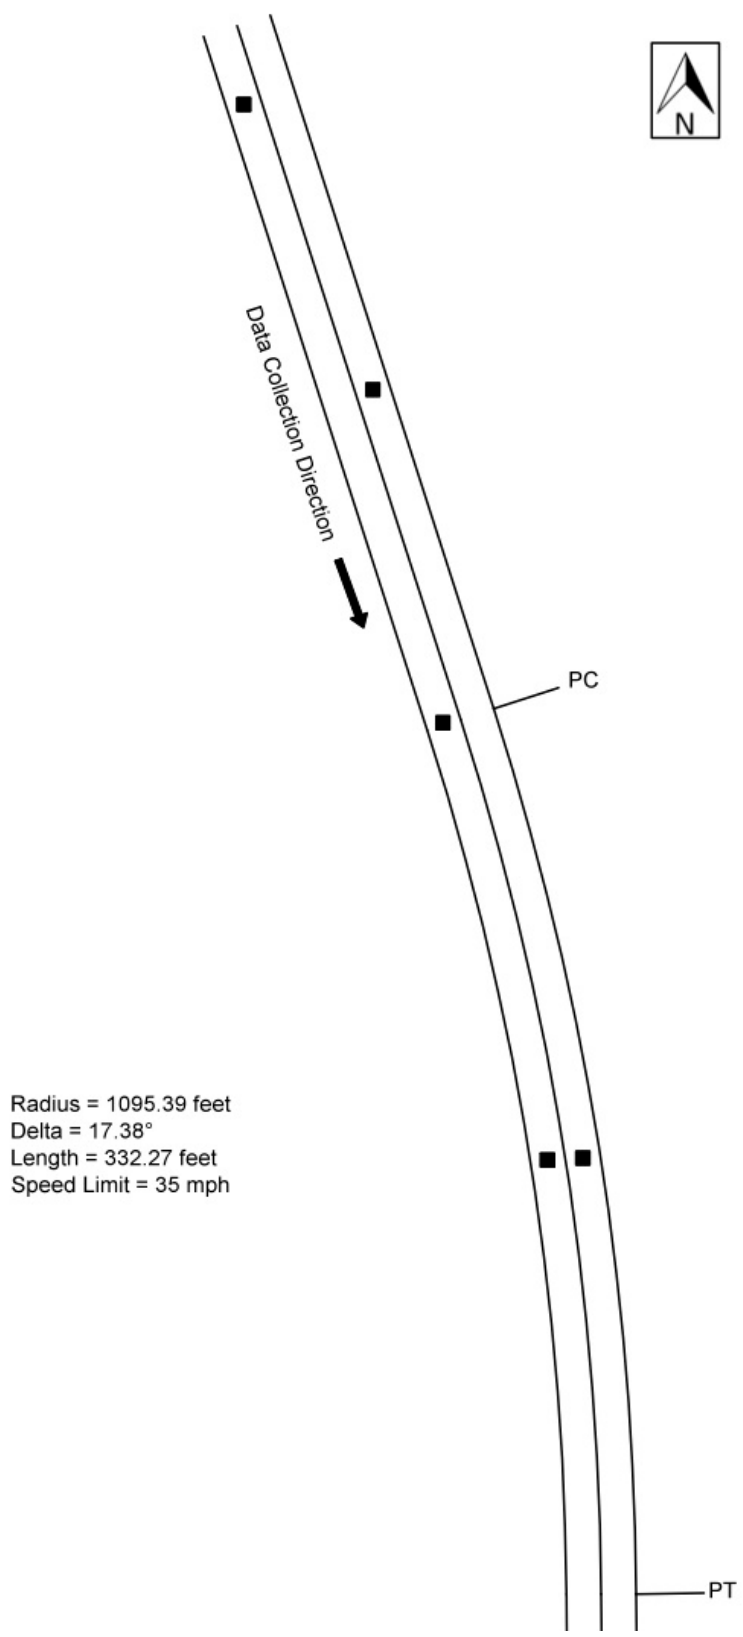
Diagram. Geometric layout of southbound County Route 1 (not to scale).
